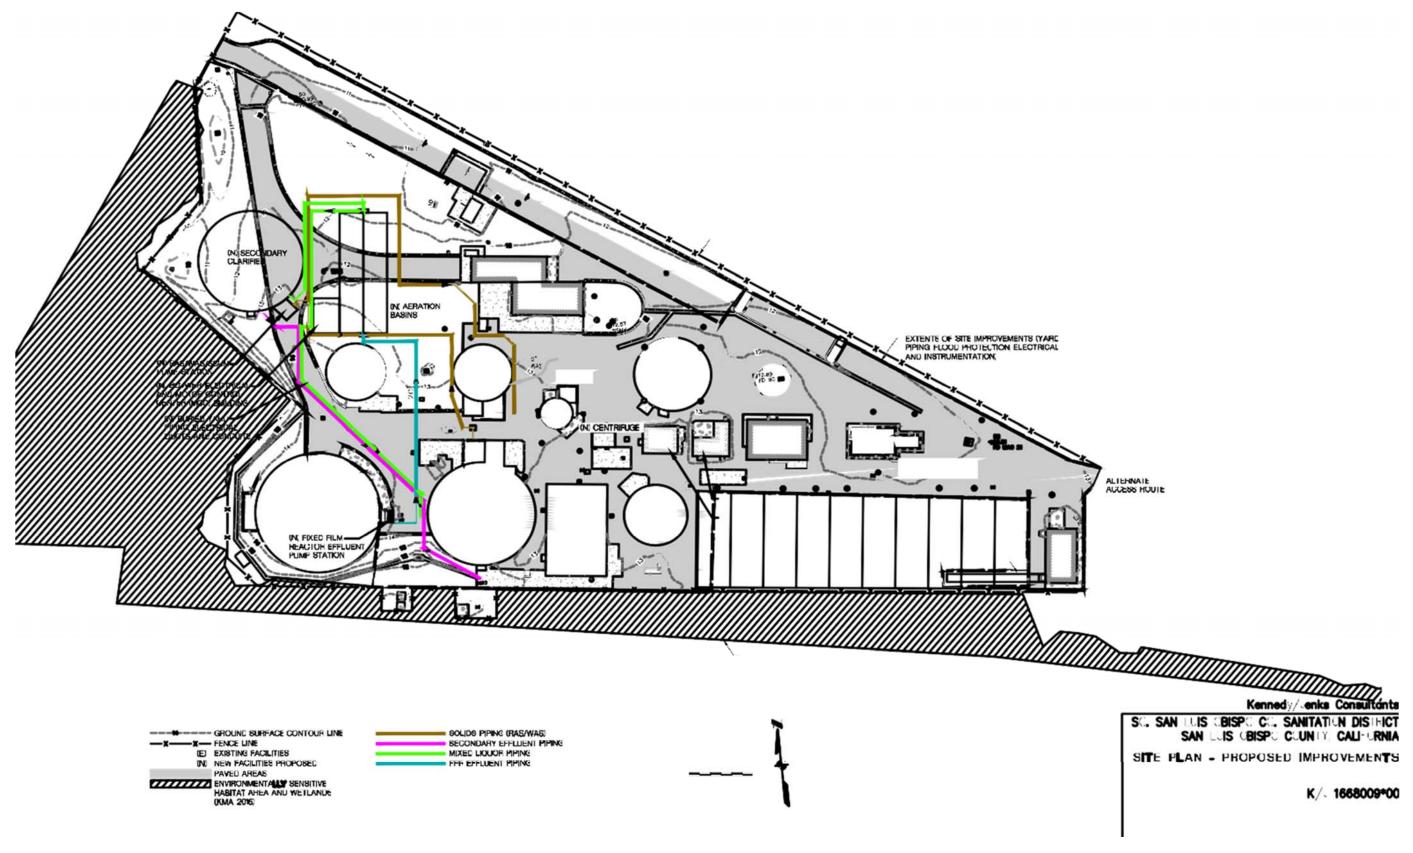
Proposed Facilities Site Layout at the District WWTP after Redundancy Project
